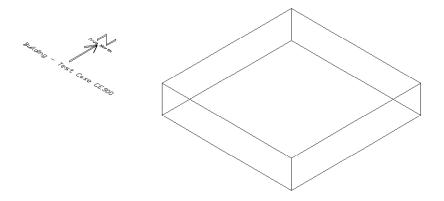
Base Building (Case CE300) - Isometric View of Southeast Corner
